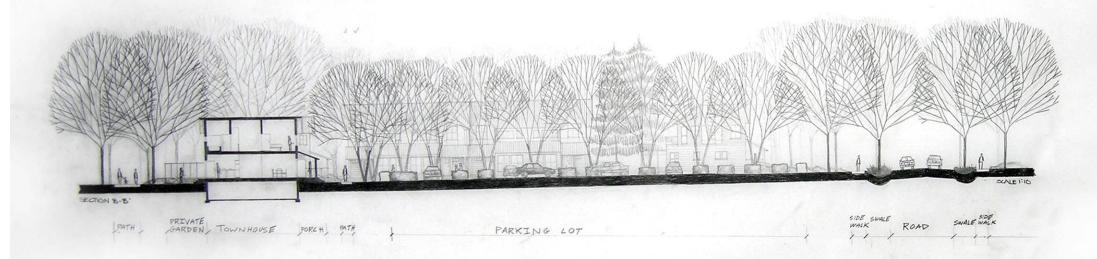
Drumlin Concept; Section through private garden, row housing, parking court and streetscape.
